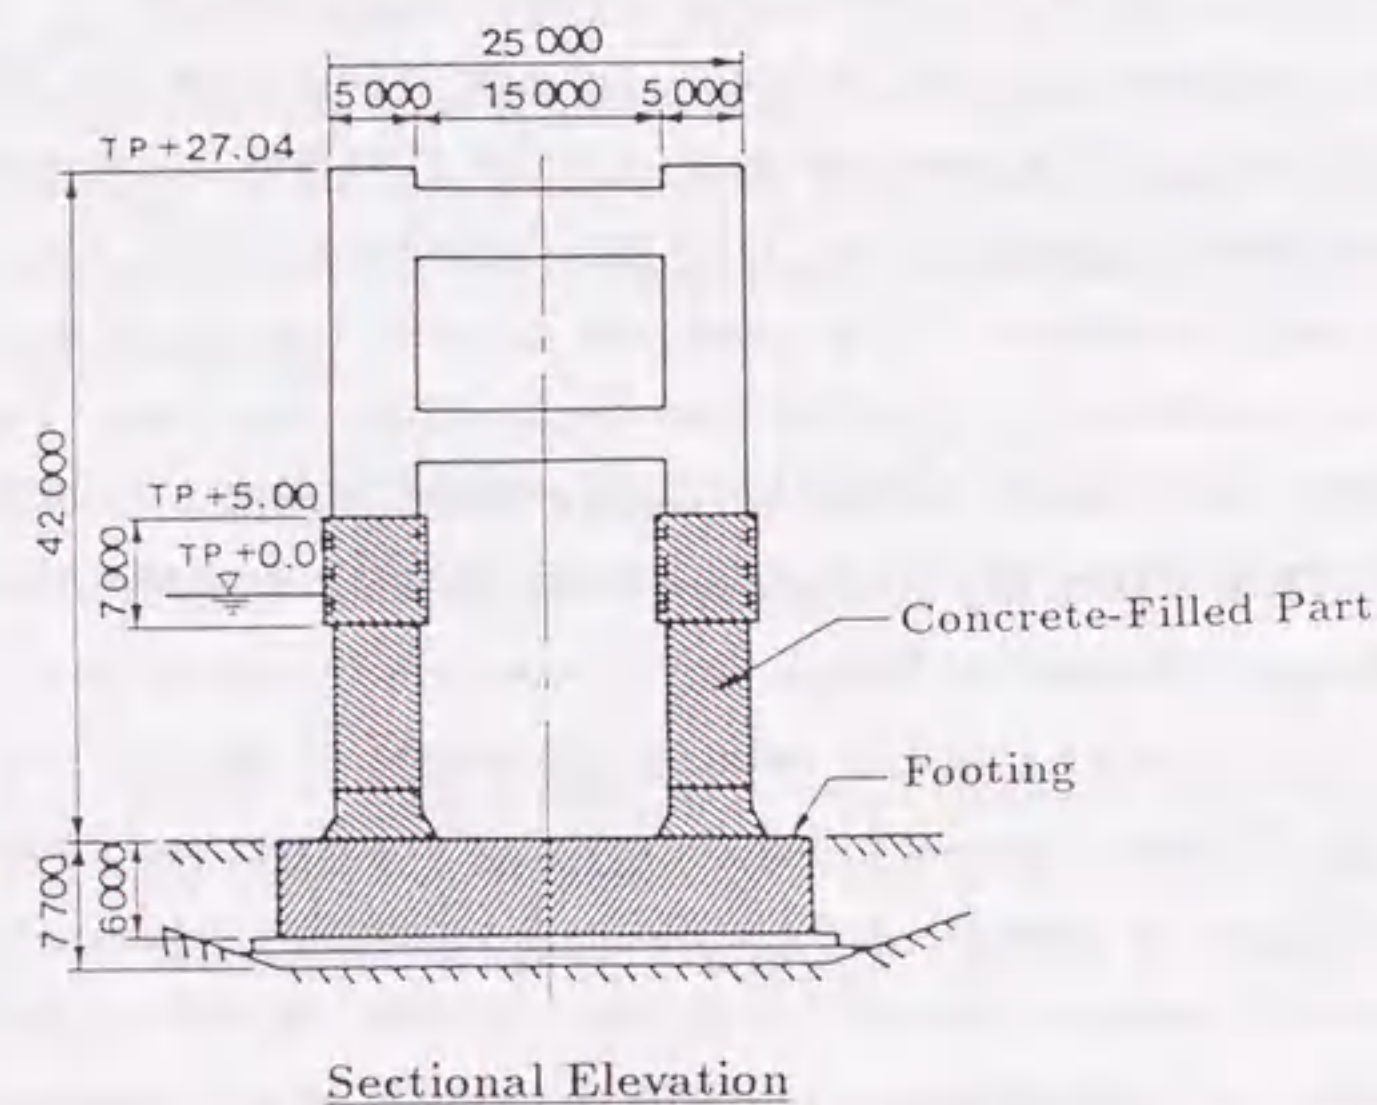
Bridge Piers of Kansai International Airport Connection Bridge
